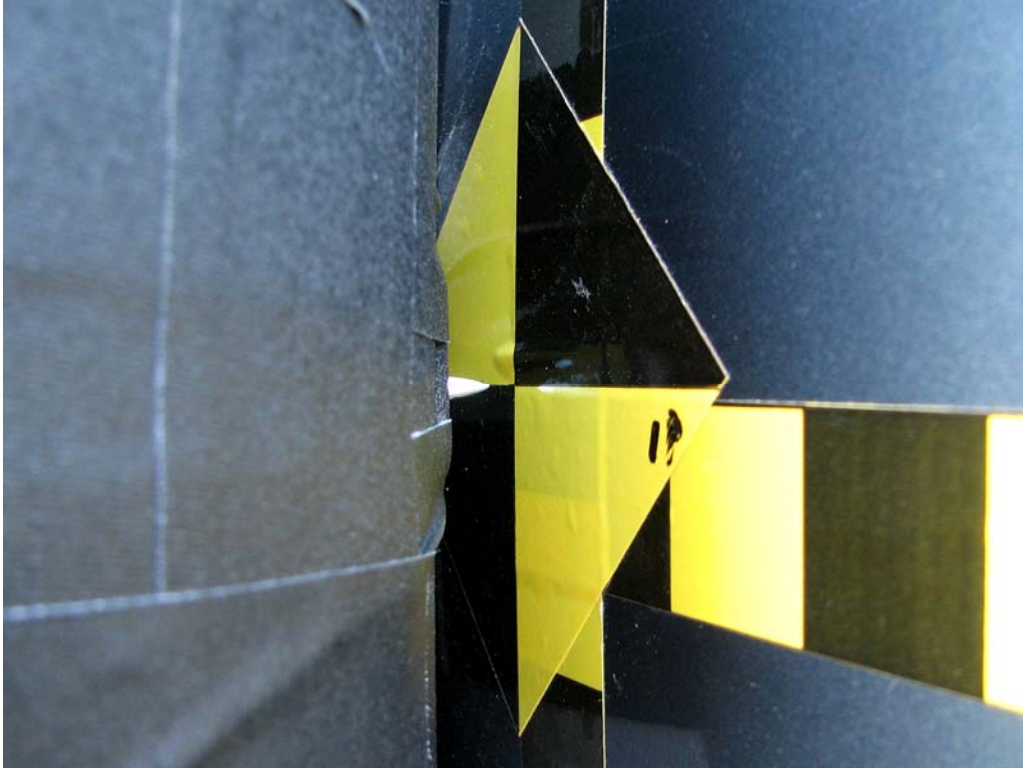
Pre-Test Close-Up View of Impact Point Target
